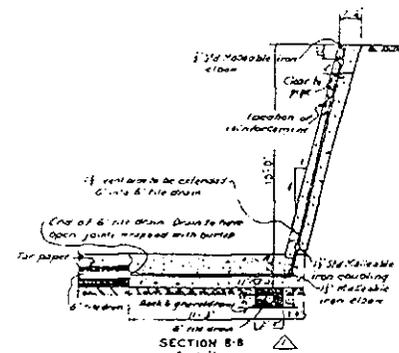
Cantilevered Reinforced Concrete Wall.
